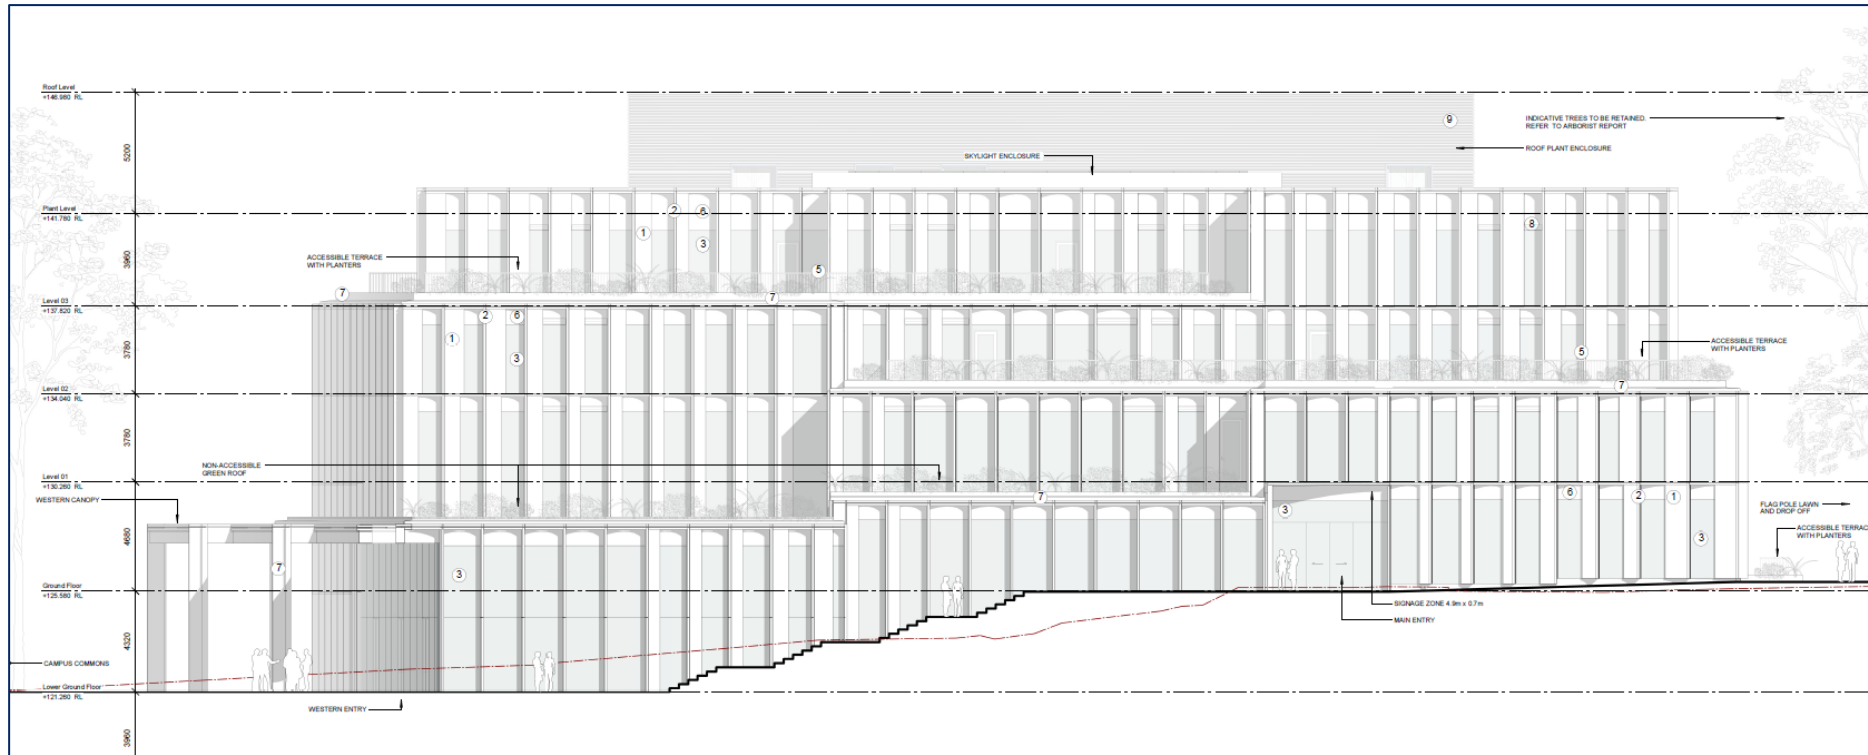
| South elevation (Source: Applicant's EIS 2025)
